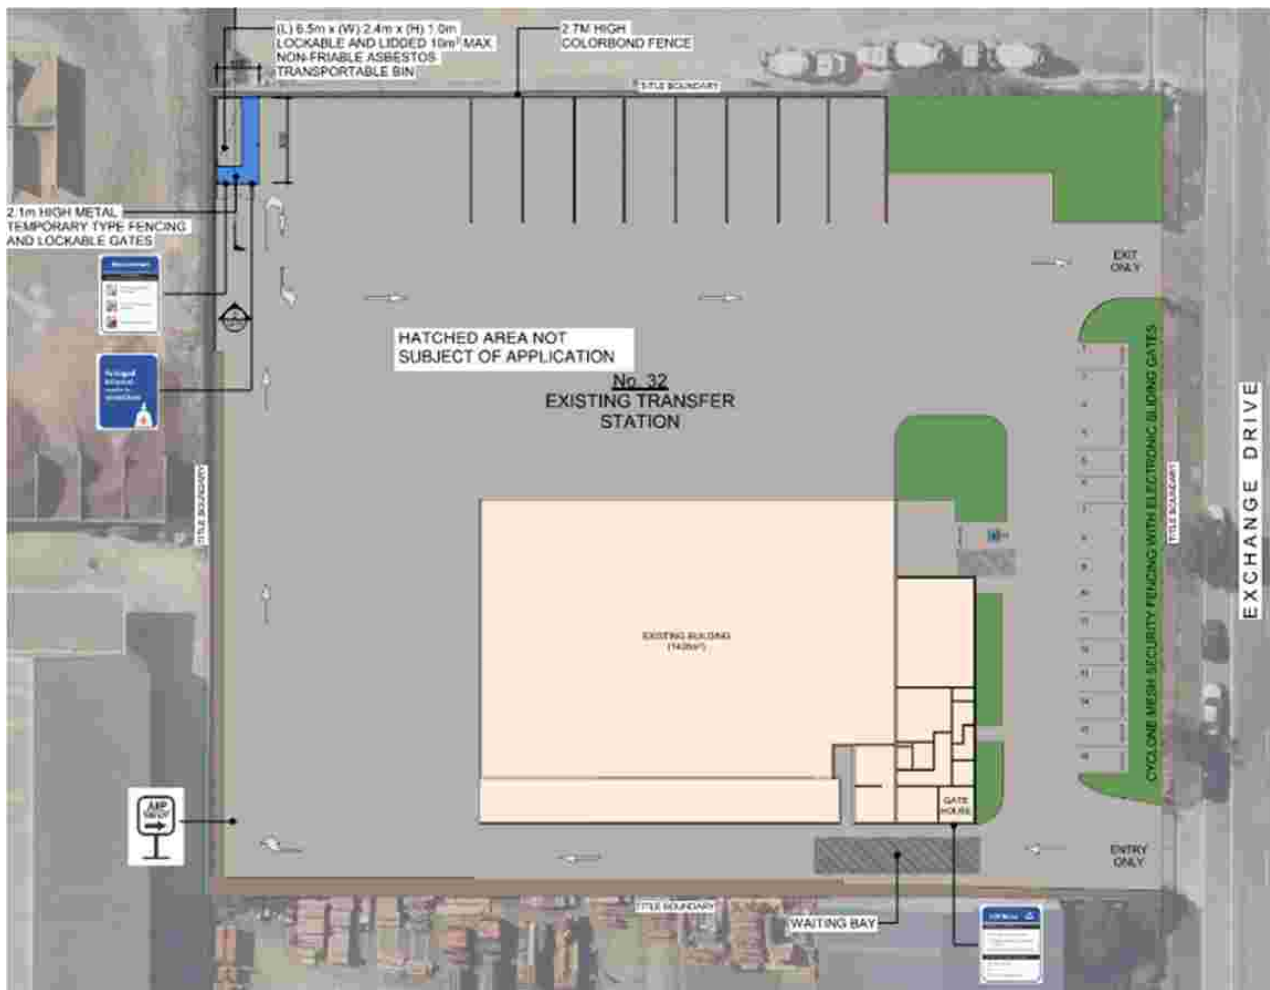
Site Plan Asbestos Disposal Point area in blue.
